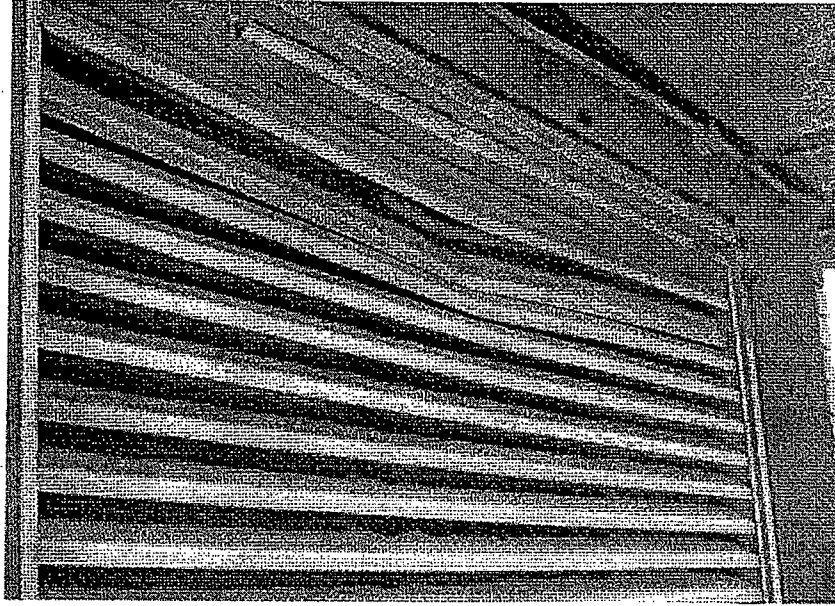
Windows and Louvres – Damaged louvre blades.
